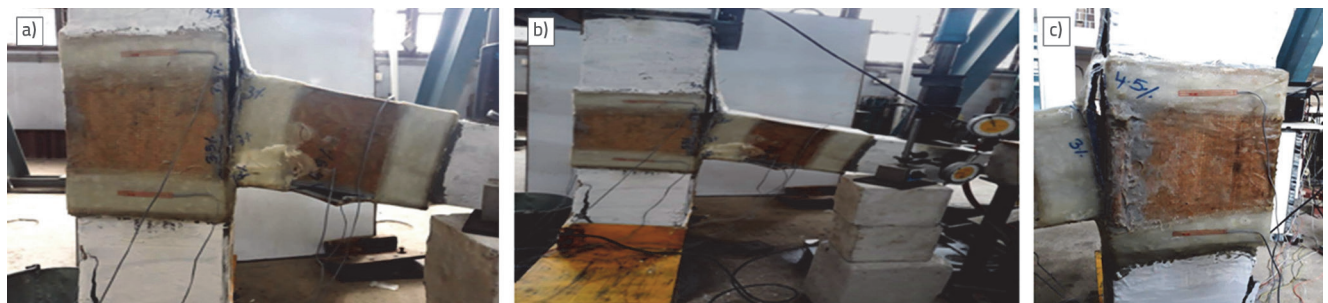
Crack pattern of S3ARF: a) failure at 5 %; b) failure at 6 %; c) complete failure at 6 %
